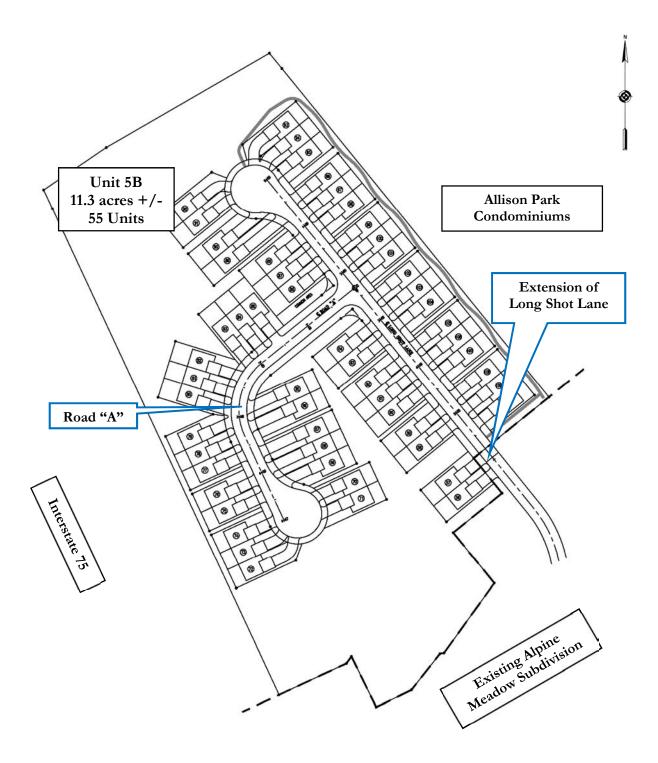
Plan Layout Alpine Meadow – Unit 5B
